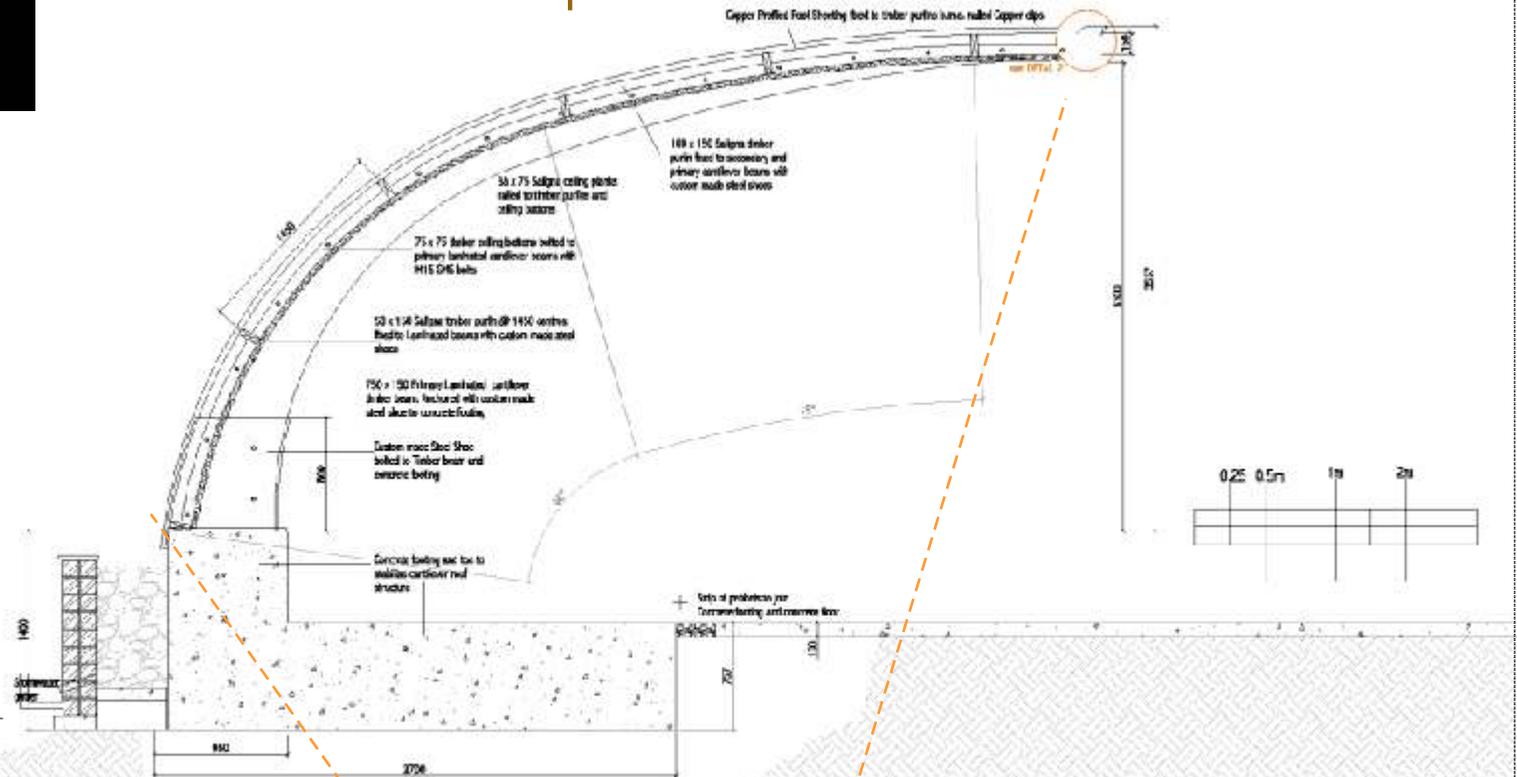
Detail section through the Chapel roof showing the cantilever timber structure. See A0 drawing page 6 no 6.2
